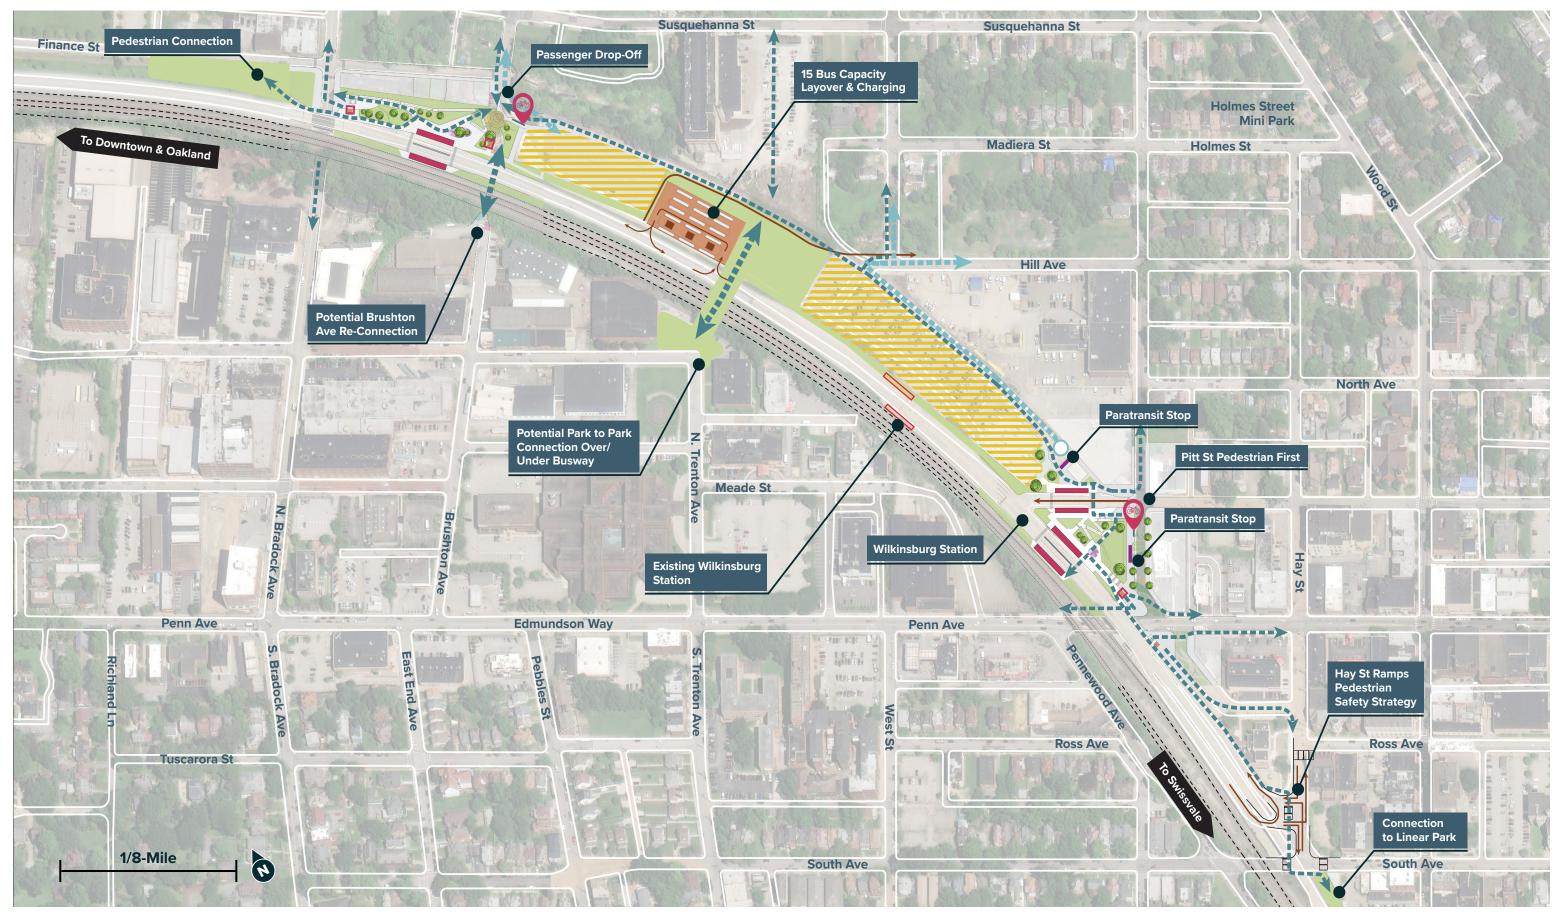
Wilkinsburg and Brushton Stations Conceptual Design Site Plan
